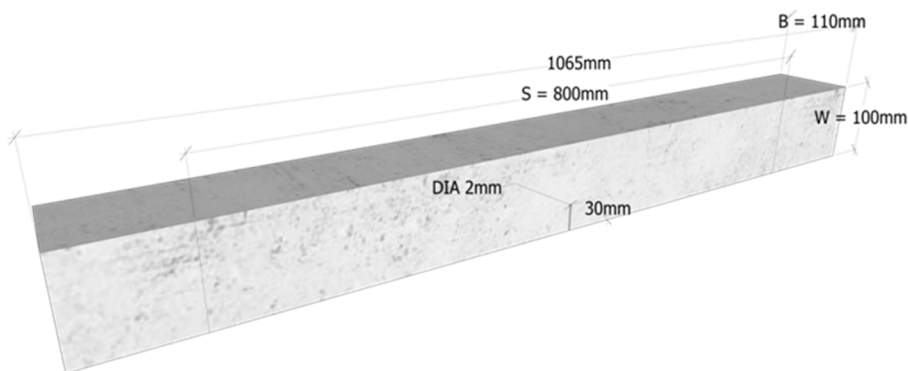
Dimensions for 30-mm (31.68 mm) notched concrete beam specimen for engineering simulation purposes.
